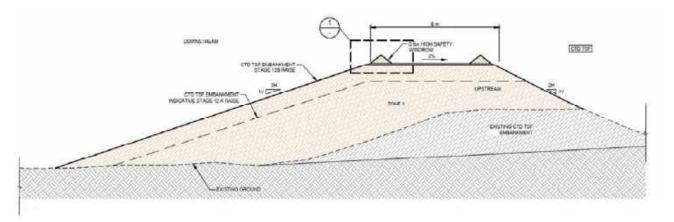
Stage 12 typical cross section with indicative Stage 12A and 12B raise profile
